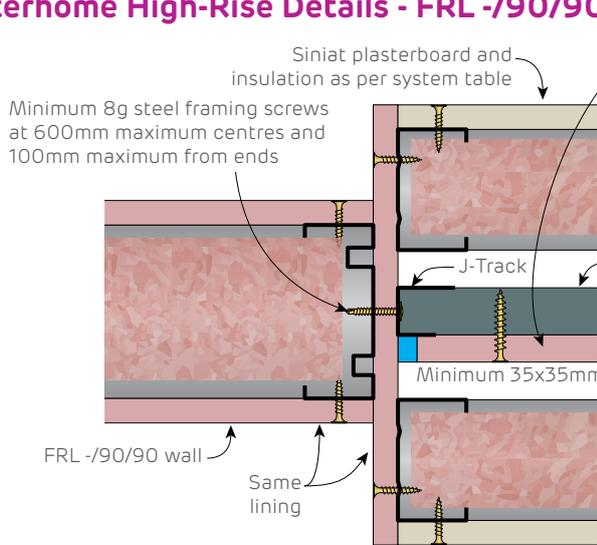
Interhome Highrise Wall Transition to Single Stud Fire Rated Plasterboard Wall Plan
